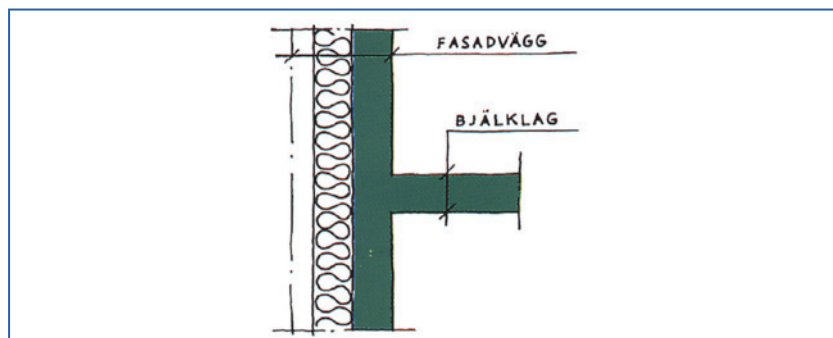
Typical heavy weight façade. From left to right of the wall: Plaster + thin concrete, 10-15 cm mineral wool, 10-15 cm concrete. Fasadvägg = façade wall, Bjälklag = floor.
